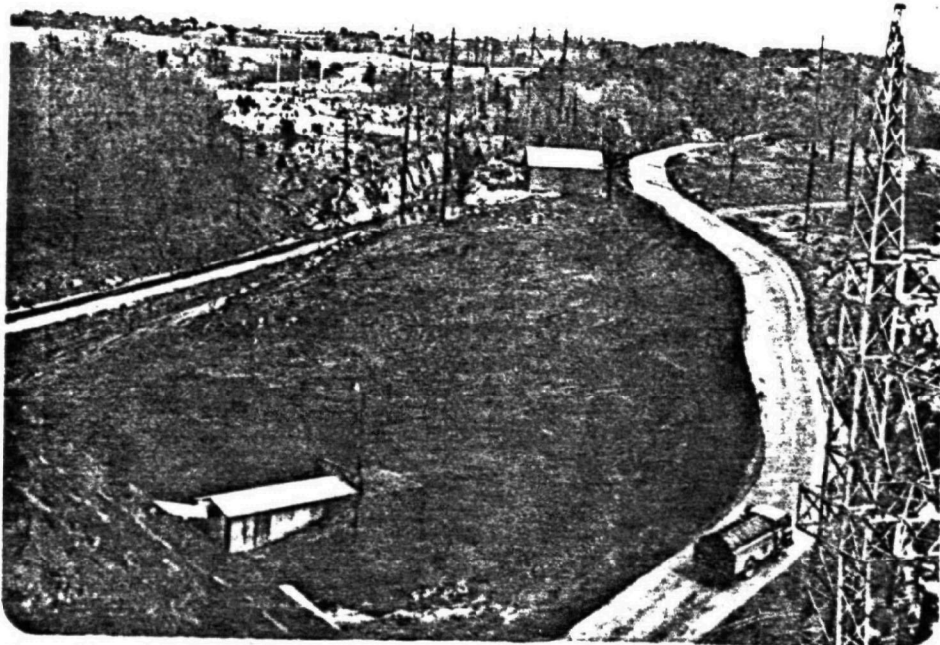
View from the roof facing north showing the coal storage area transfer station, and a portion of the electrical switchyard.
